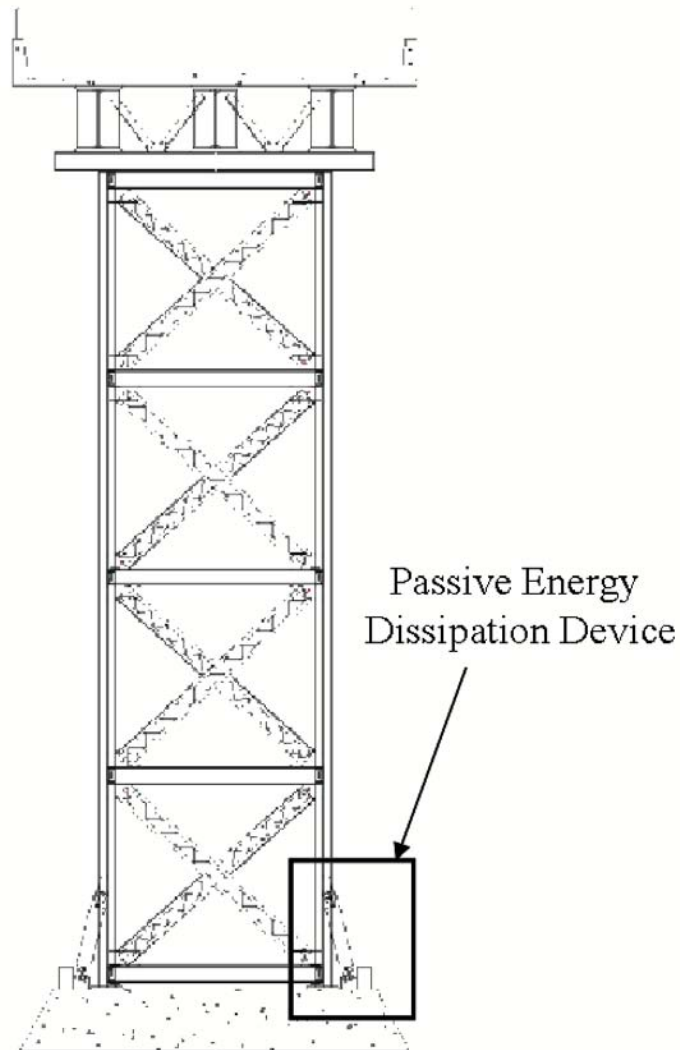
Sketch of Controlled Rocking Bridge Pier
